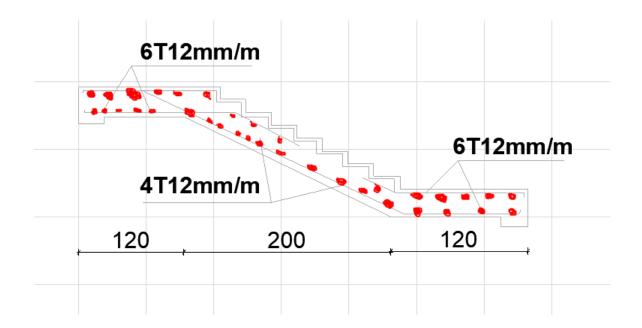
9:Indicated Steel Arrangement (Stair Case)
